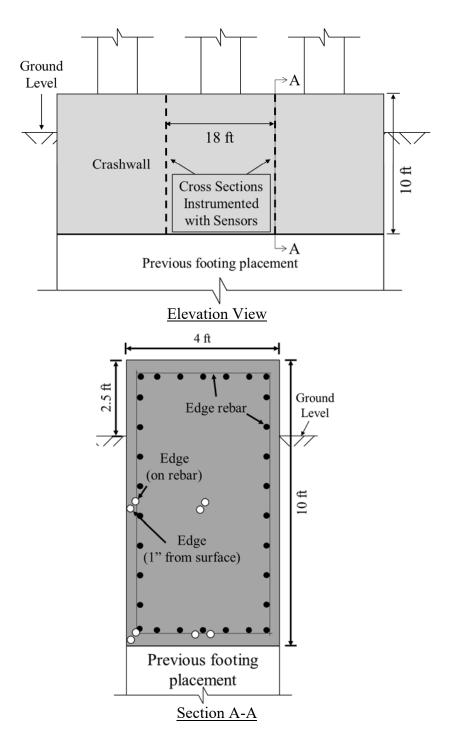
Harpersville crashwall instrumented cross section locations (top) and temperature sensor locations on these cross sections (bottom)
